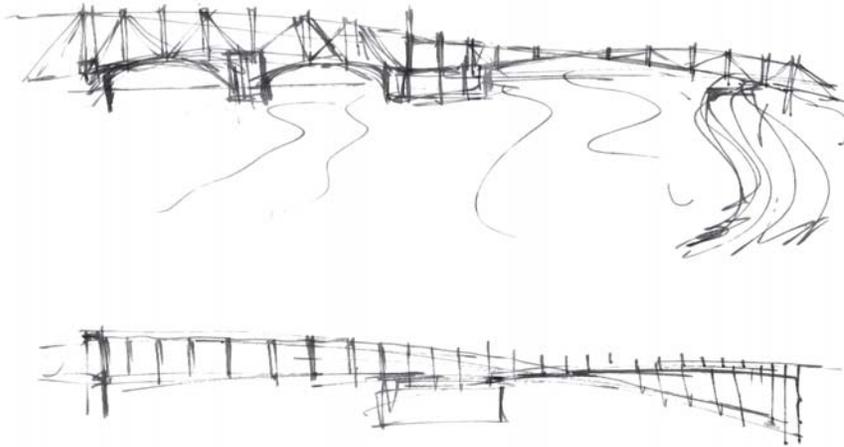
AXO SKETCHES FOR NEW BRIDGE
